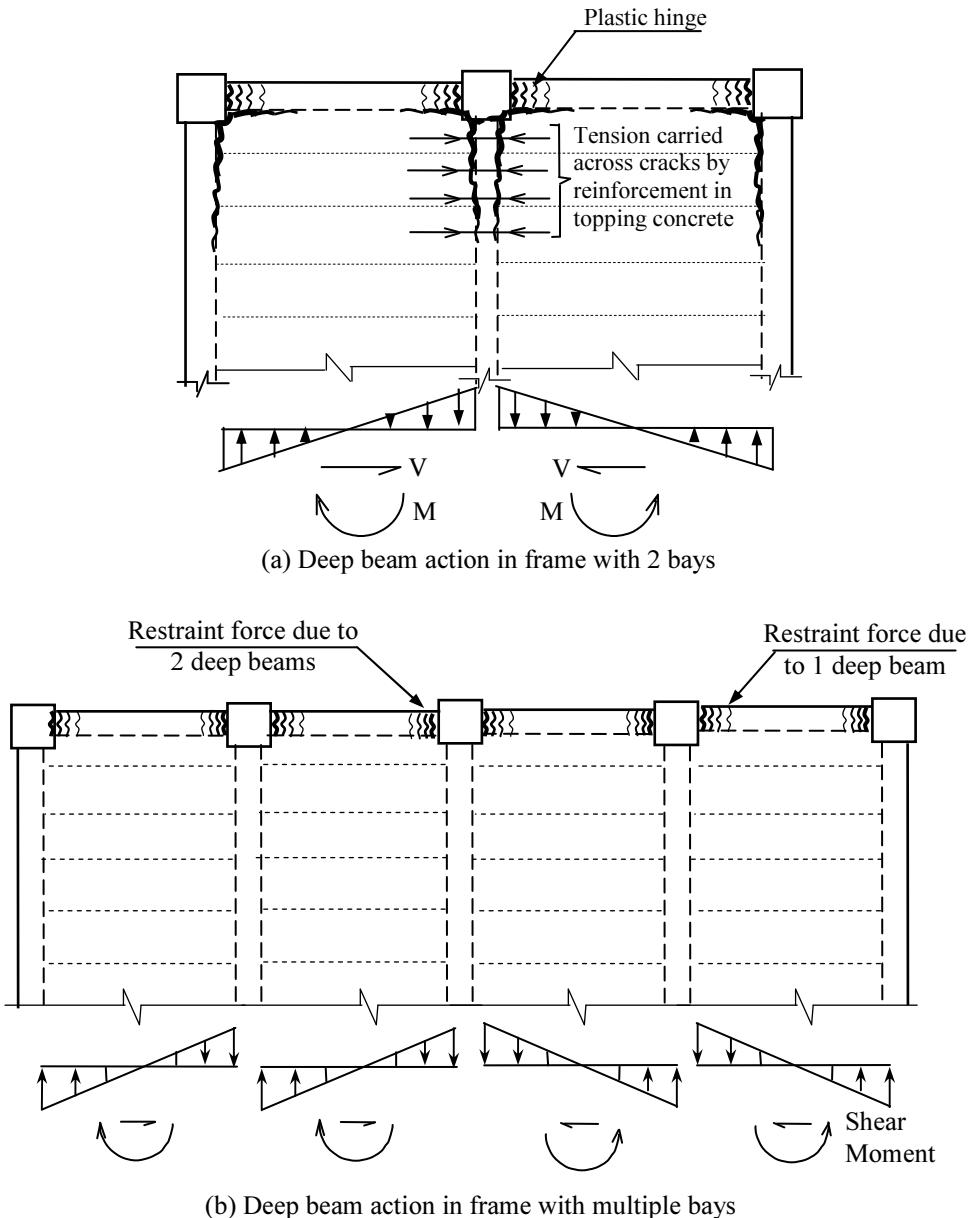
Interaction of floor and beam where precast floor units span passed the beam plastic hinges
